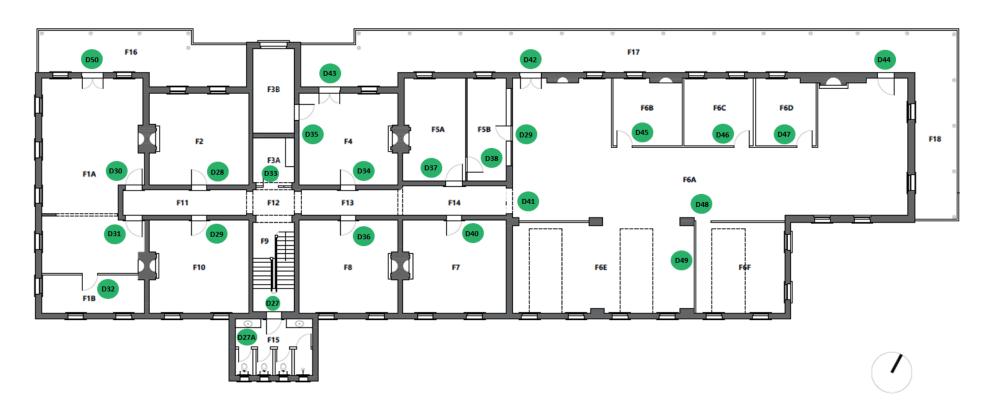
Plan of First Floor of CME Building with Door Numbers
